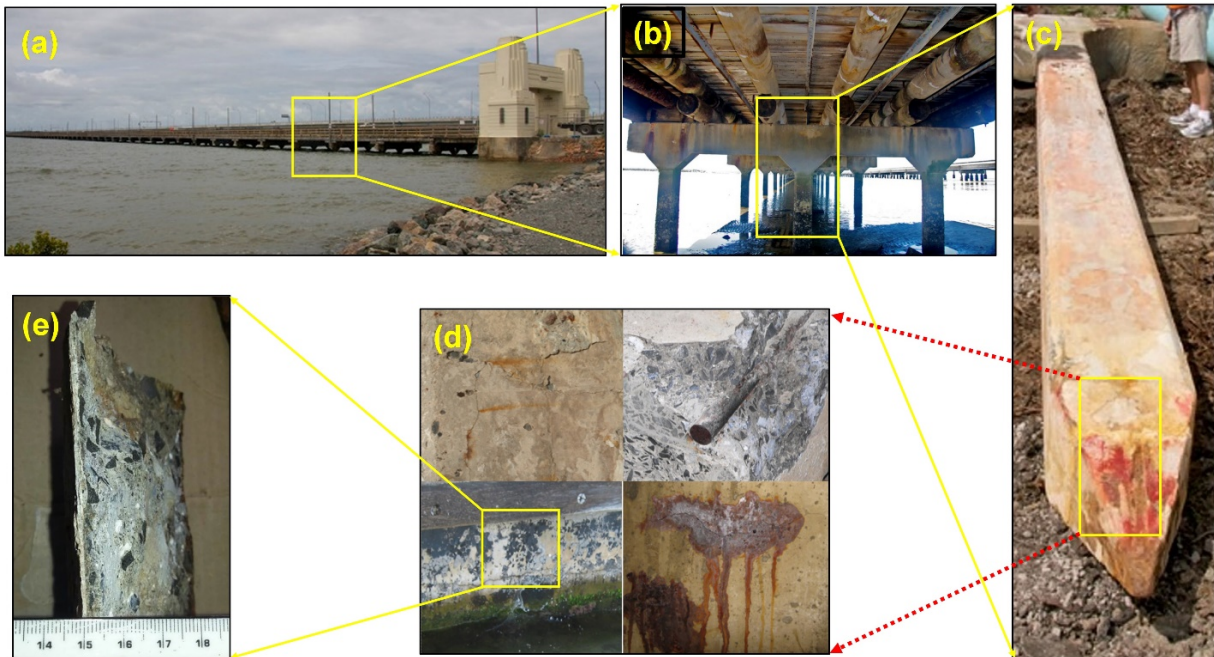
Deterioration of Hornibrook Highway Bridge, Australia [133-136]: (a) Hornibrook Highway Bridge; (b) Underside of bridge; (c) Typical complete pile recovered; (d) Minor longitudinal and transverse concrete cracking; (e) Longitudinal cross-sectional.
